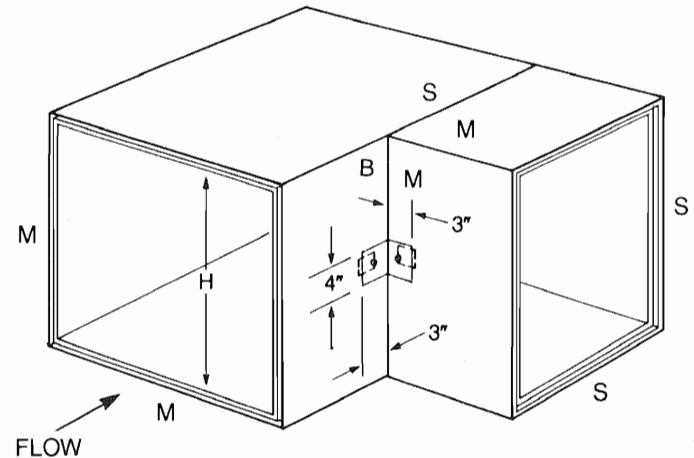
SHEET METAL ANGLE REINFORCEMENT AT THROAT, 90 DEGREE ELBOWS
